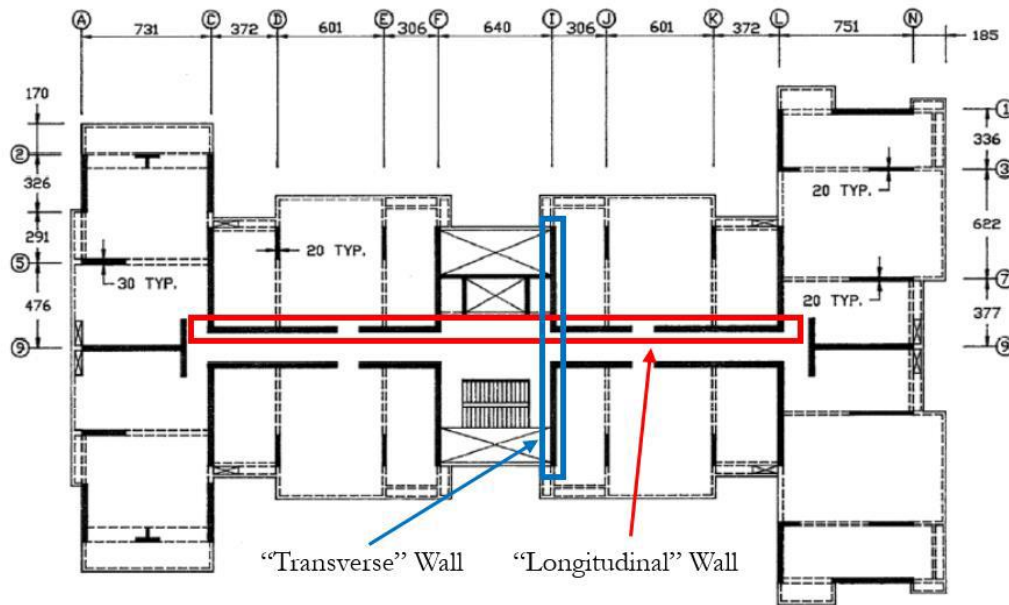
Typical floor plan layout of Chilean walled buildings (Wallace, 2011).
